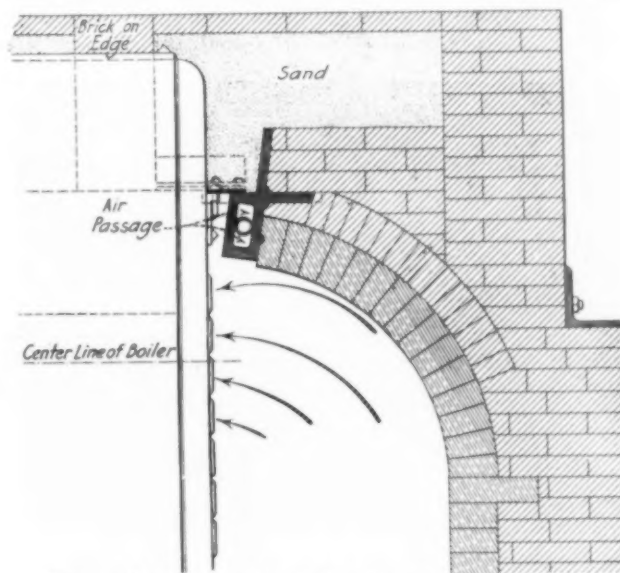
WOOLSON'S GAS TIGHT BACK ARCH CONNECTION
